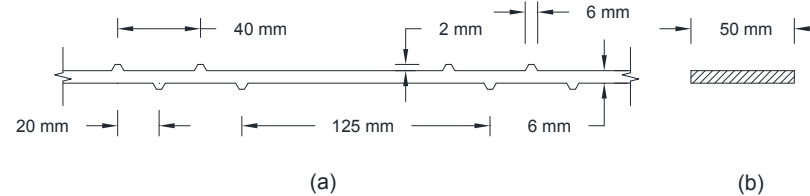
Steel ribbed reinforcement dimensions (a) elevation view, and (b) cross-section.
